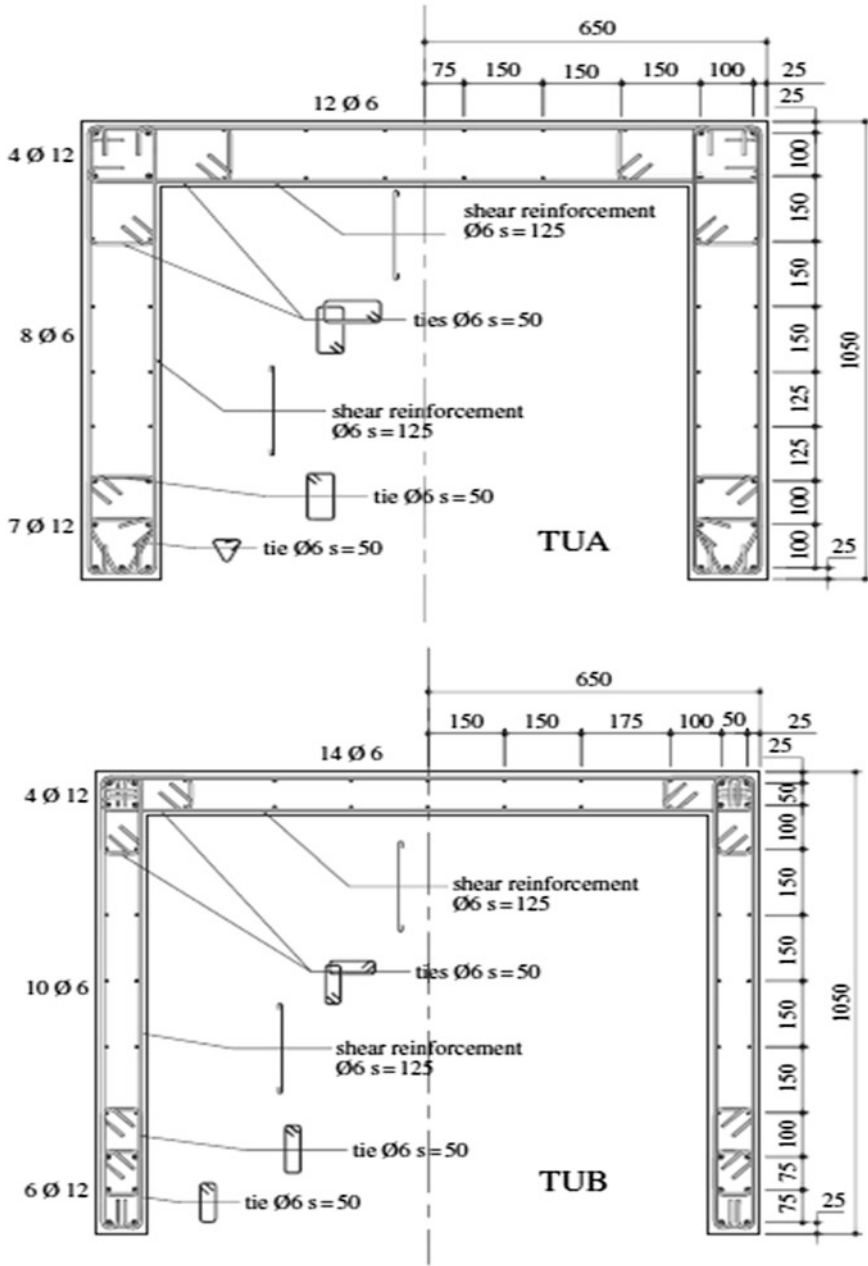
Sections and reinforcement details of wall TUA and TUB (Beyer et al. [5])
